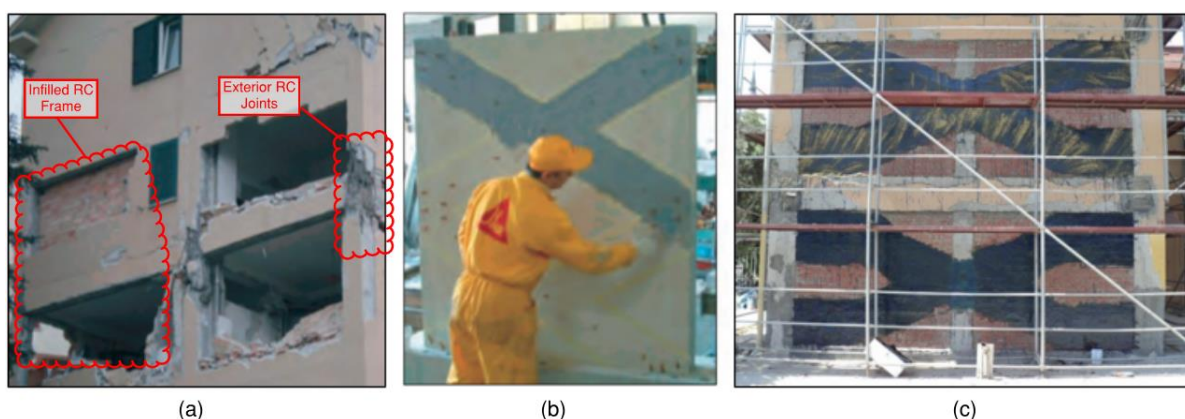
(a) A view of heavily damaged deficient RC frame; (b) Infill frame strengthening of a test specimen; (c) FRP strengthened RC frame of an office building in Istanbul
